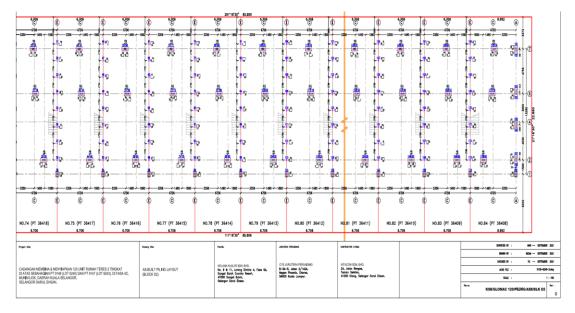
Image shows an example of an as-built piling layout submitted to the consultant engineer.
